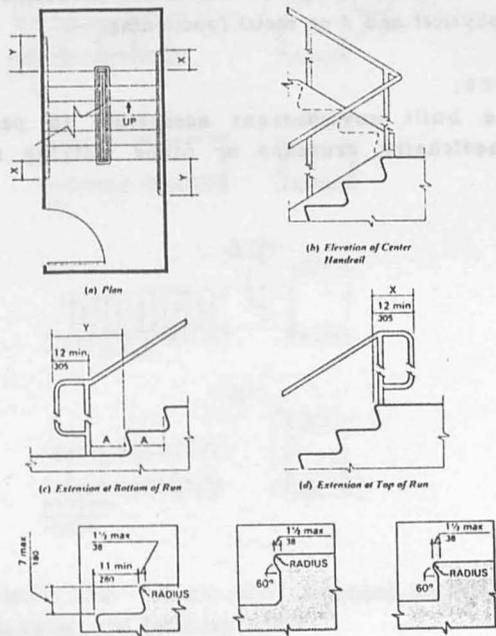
Stairs. ANSI, American National Standard for Buildings and Facilities, 1986.
